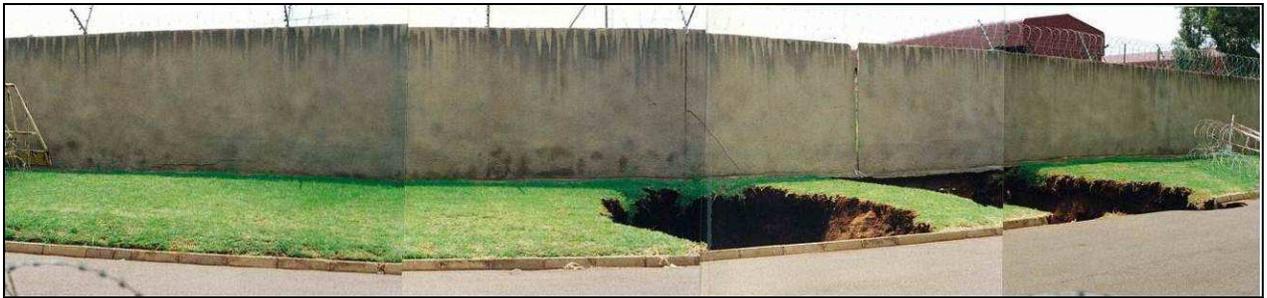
Sinkholes outside boundary wall of Waterkloof Airforce Base, Tshwane (1996), due to poor surface drainage (stormwater damming up behind wall). (Photo from CGS archives).
